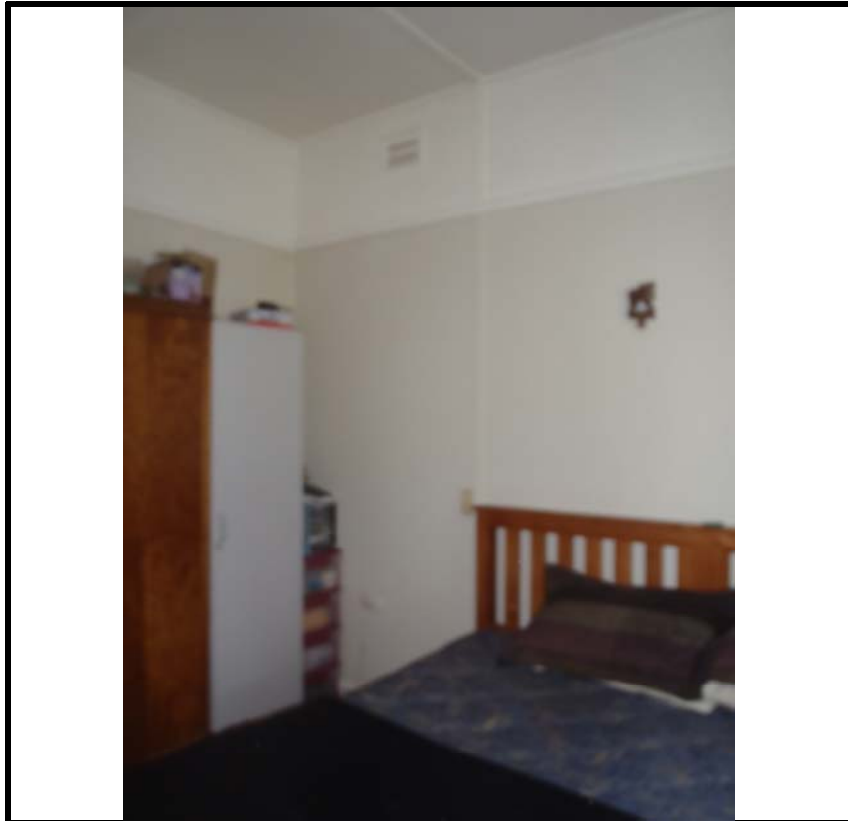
ACM sheeting used in the walls and ceiling to the main bedroom at 1McLeod Road.
